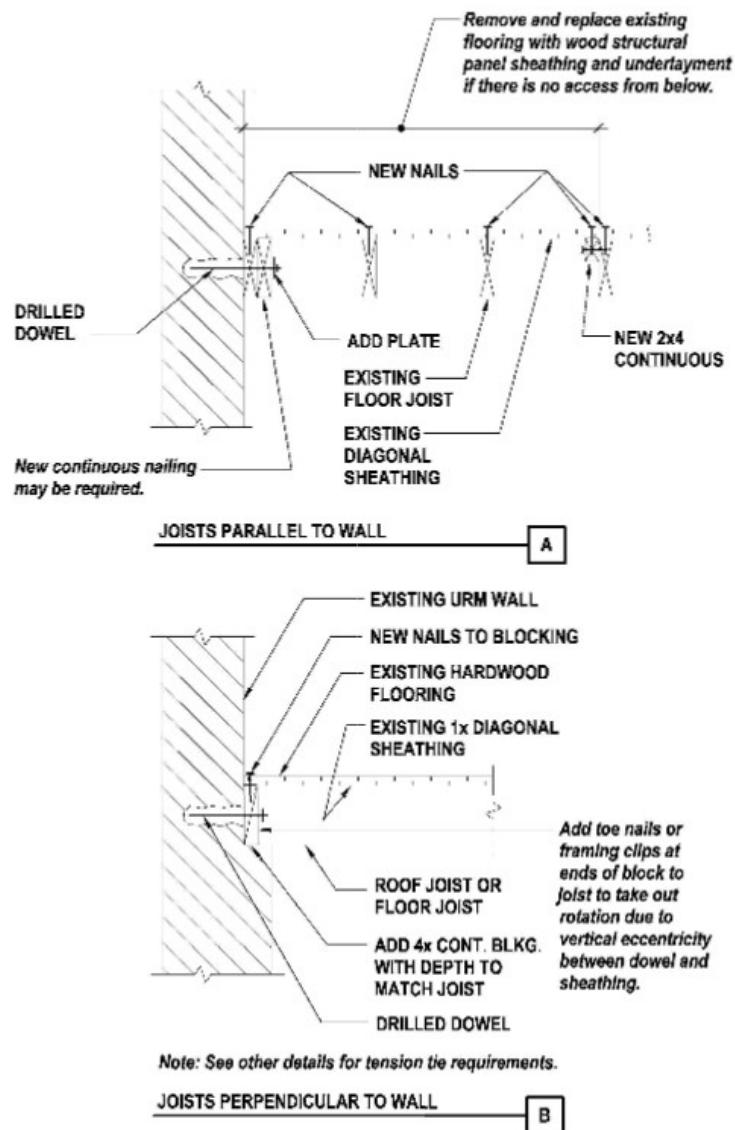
Floor-to-Wall Shear Anchors
